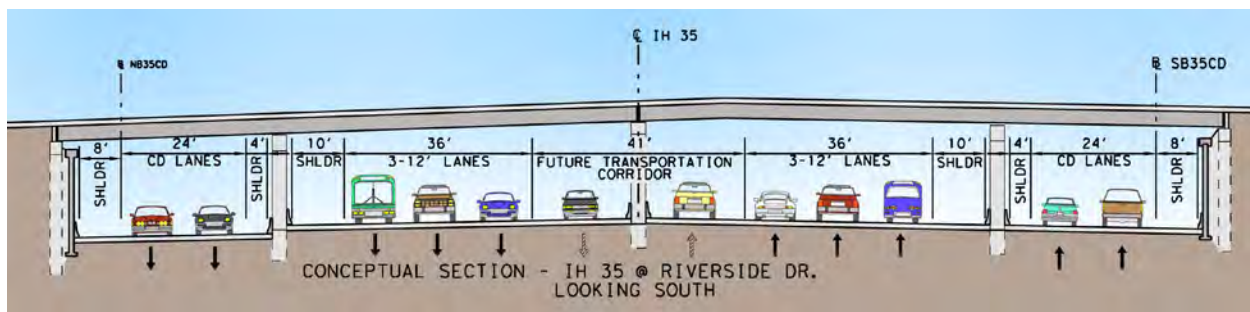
Segment 6 Conceptual Typical Section for I-35 at Riverside Drive
